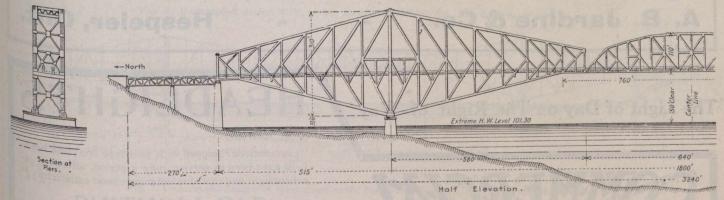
Accepted design of St. Lawrence Bridge Co., for new bridge.
